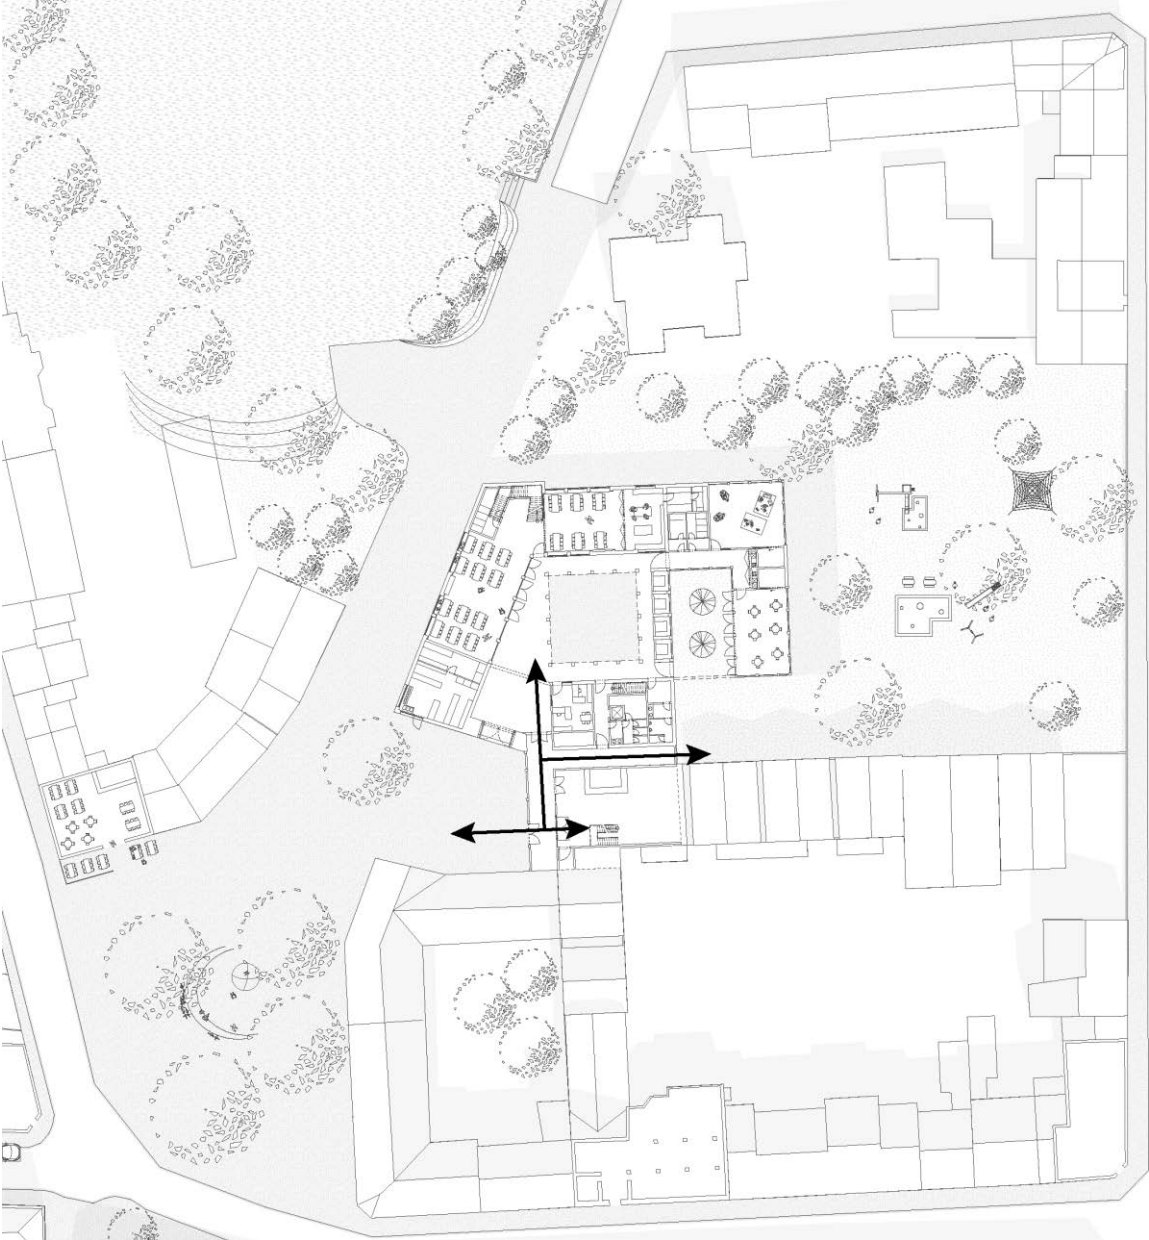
Showing the ground floor plan of the design and its connection with the kindergarten
